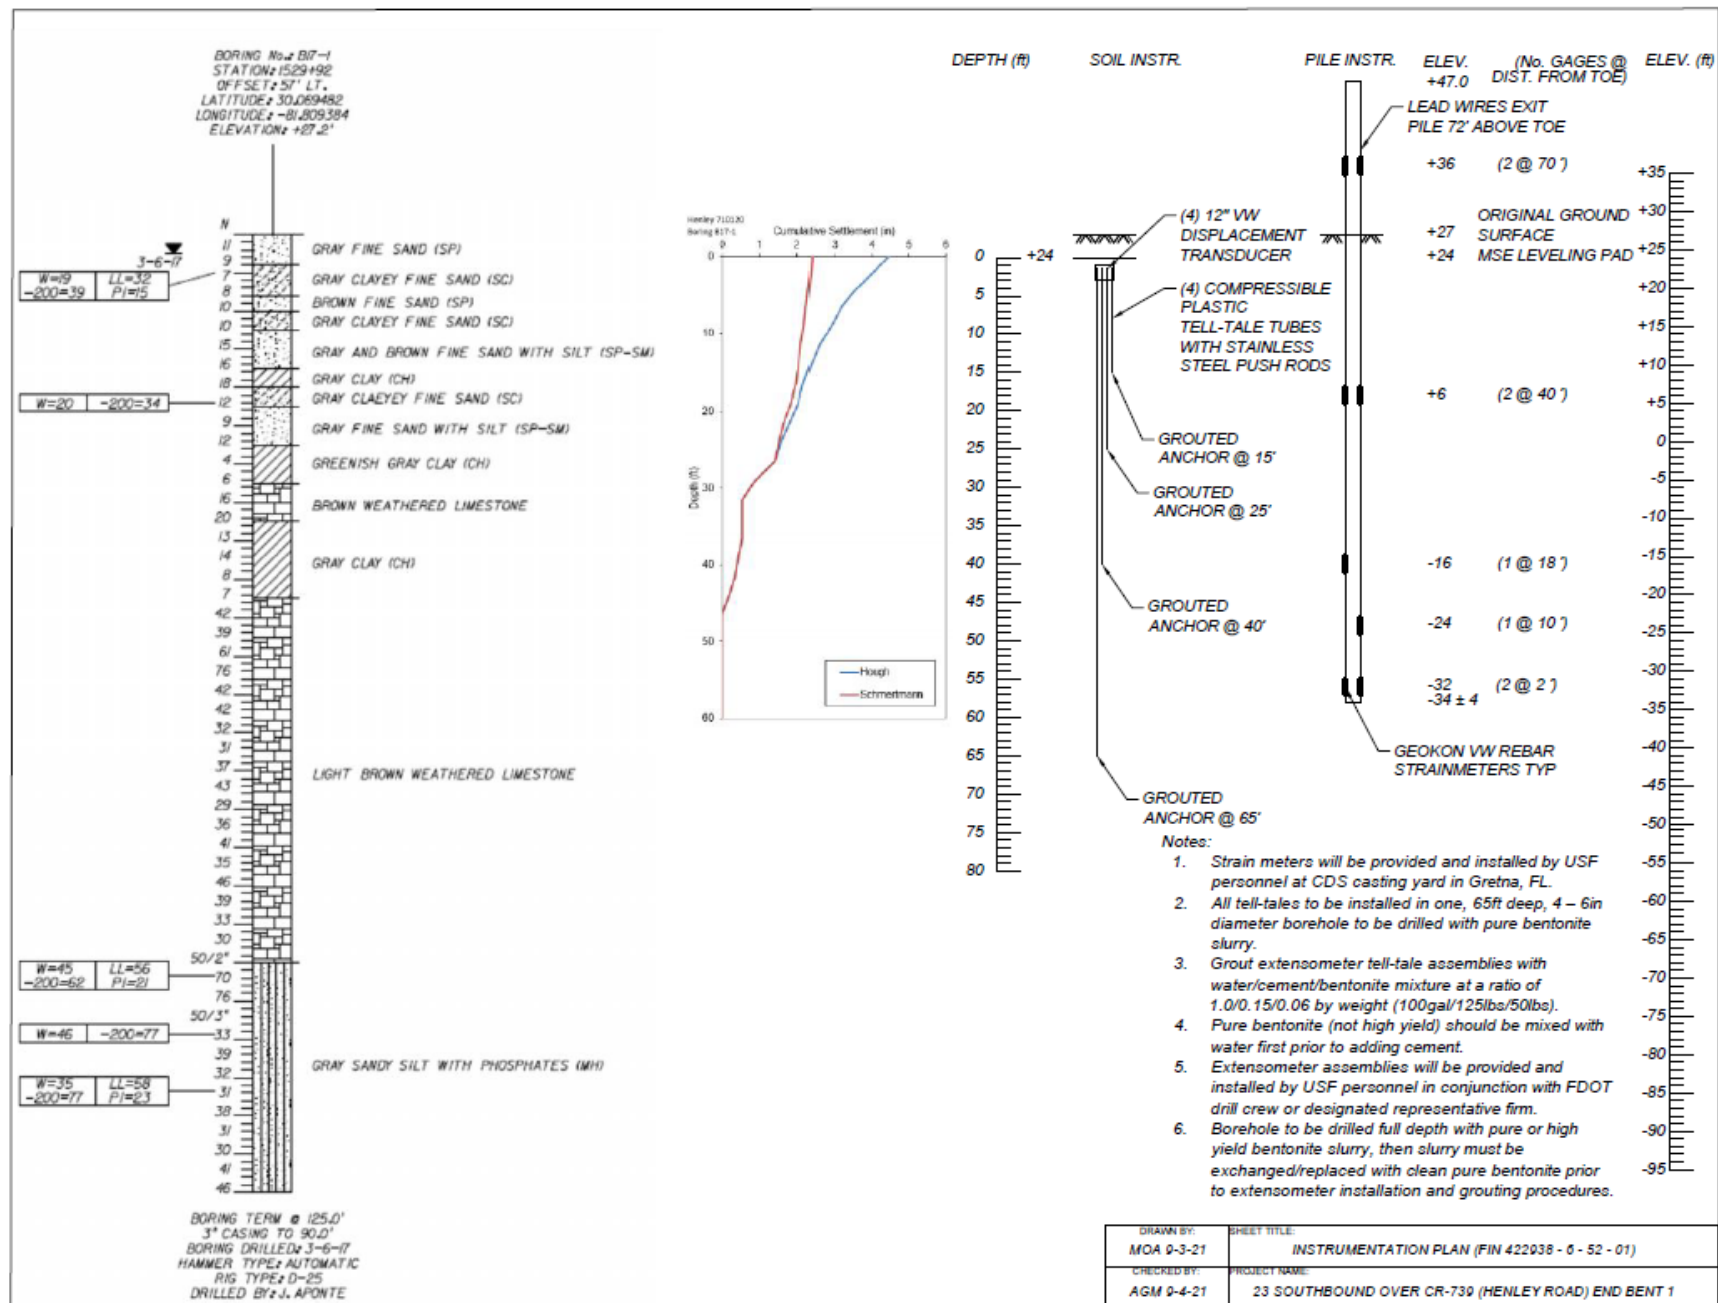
As-built Henley Road pile and soil instrumentation scheme.
